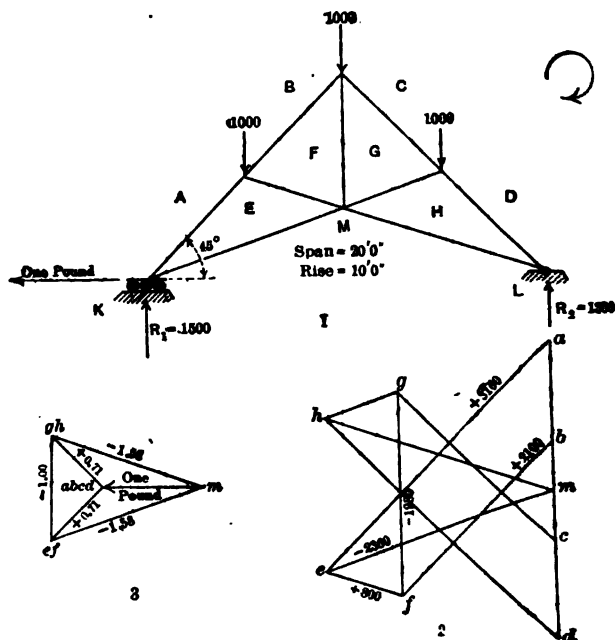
Simple Scissors Truss and Stress-diagrams
